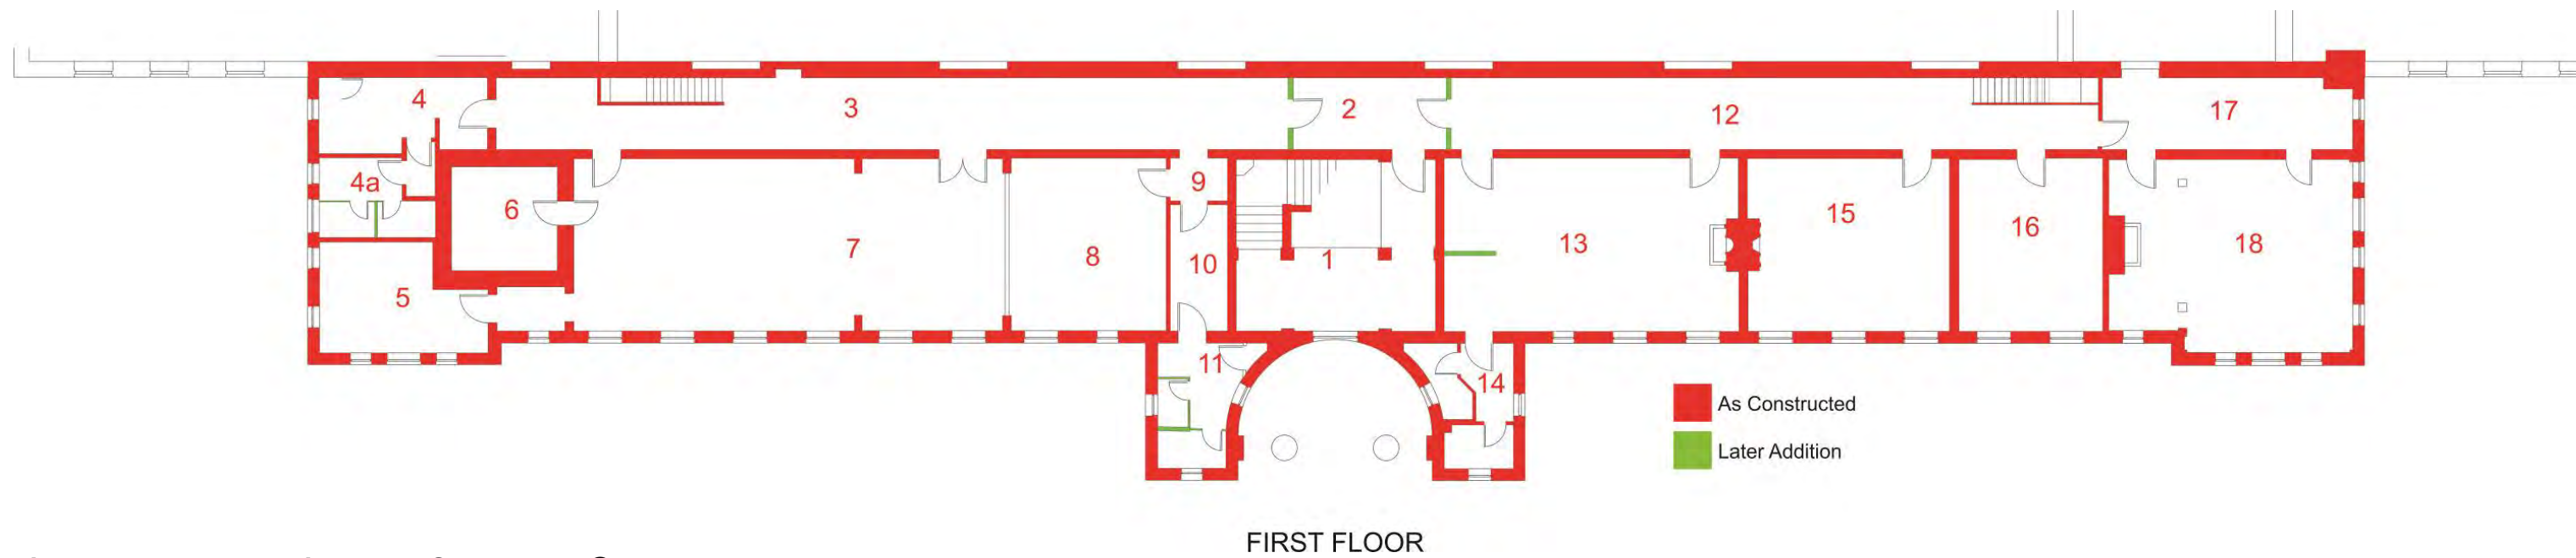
Phase Plan First Floor Scale 1:200 @ A3
